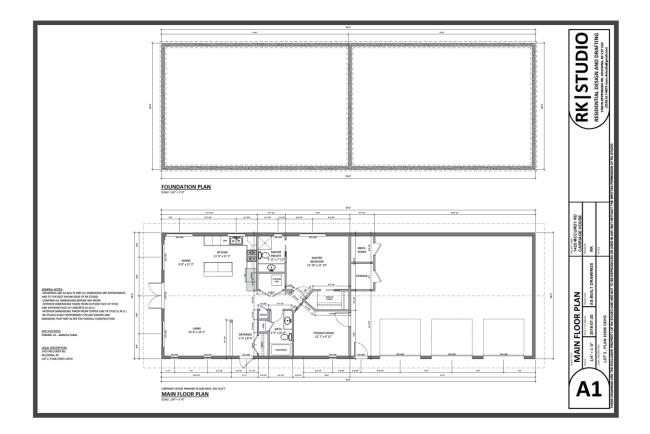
Tentative floor plan of non-farm use building. Access to storage area will be from both the suite and the garage.
